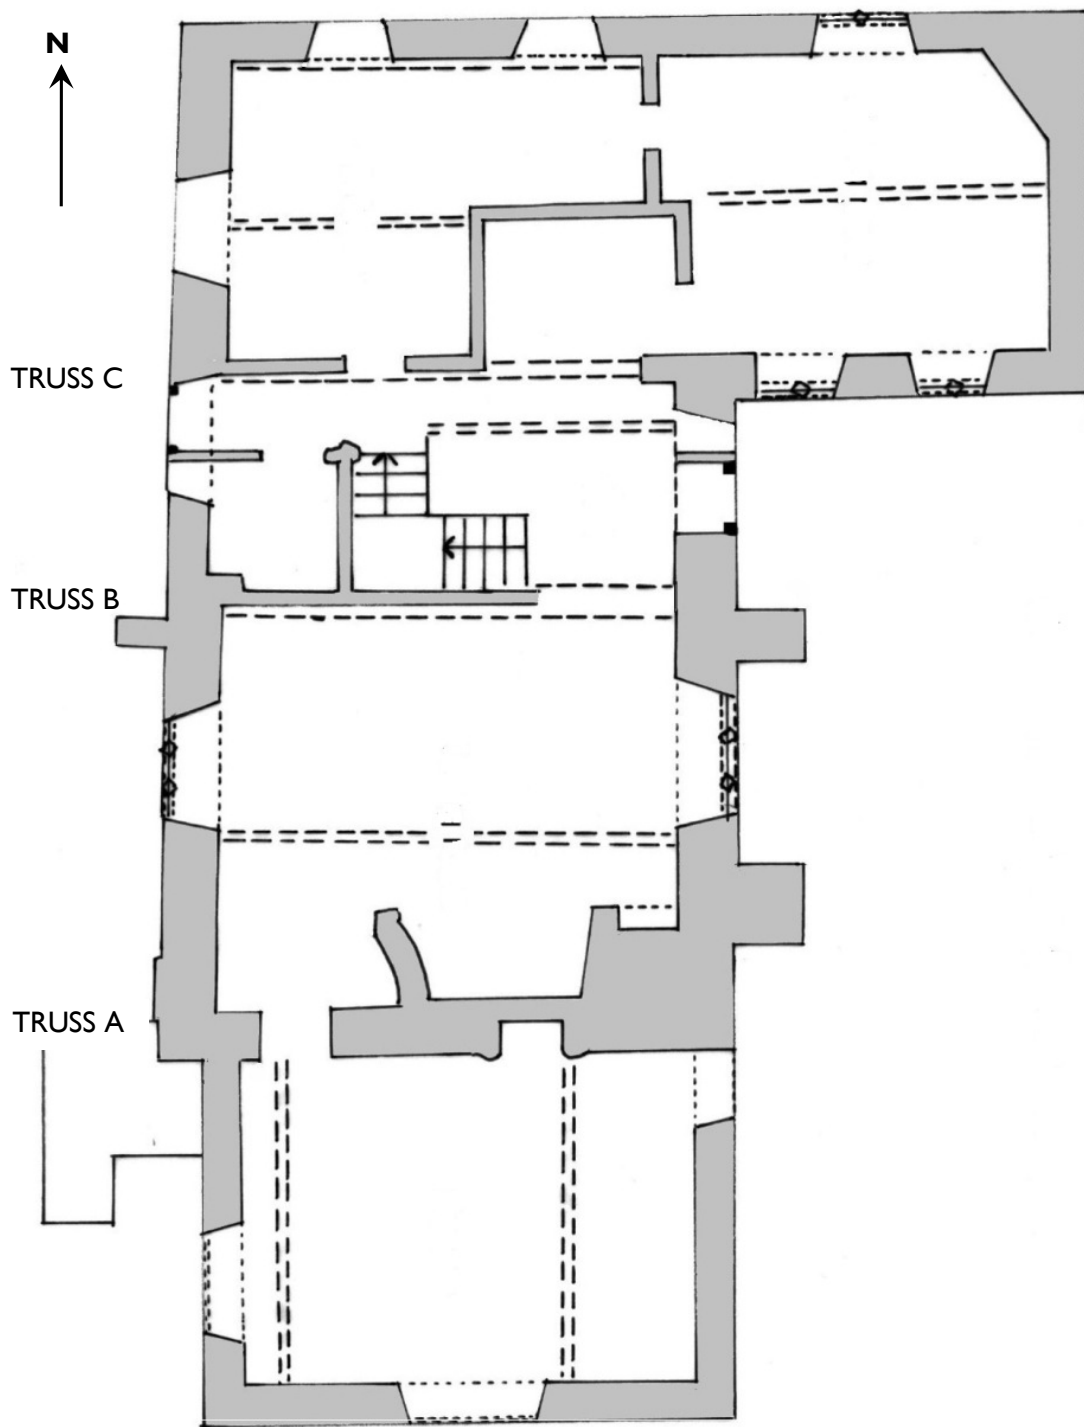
Ground-floor plan of Apshill House below (based on a drawing by Clive Carter of the Wiltshire Building Record)
